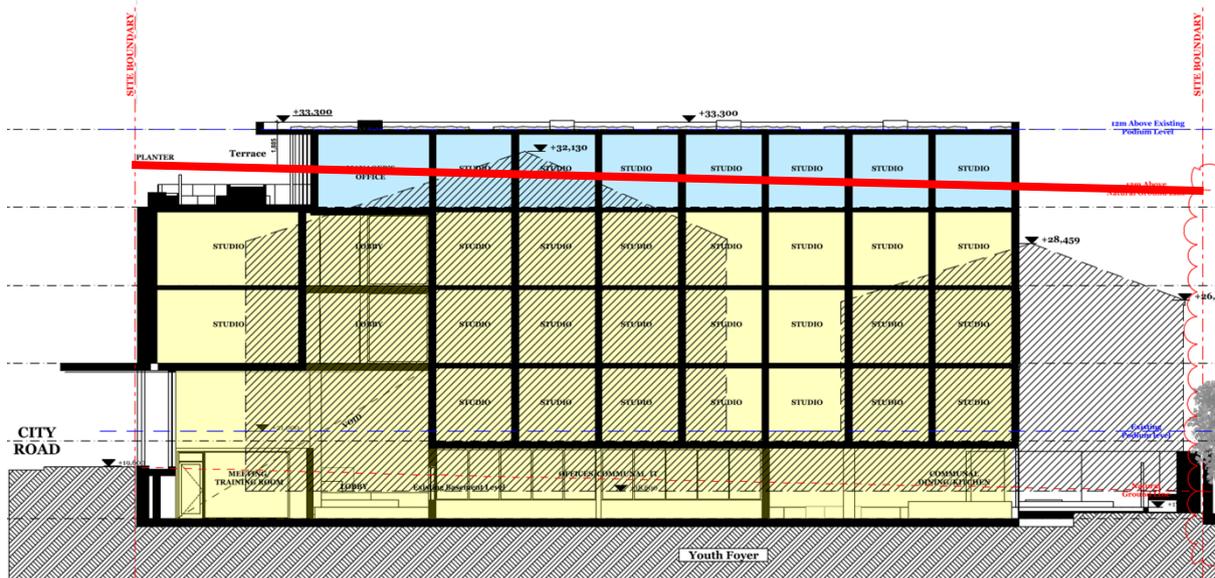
A section with the 12 metre standard (in red) and existing buildings illustrated
